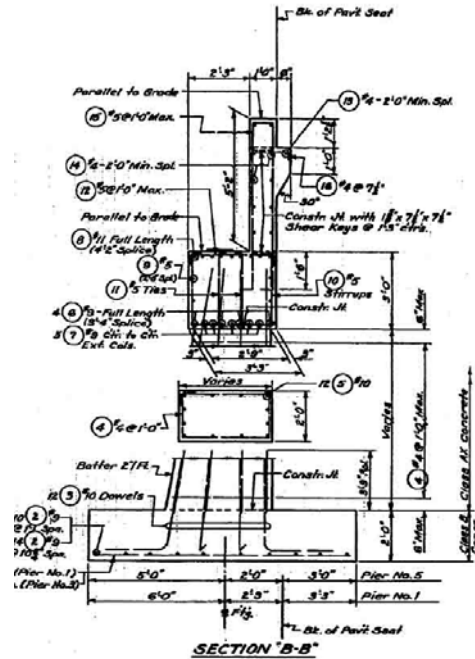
Bridge 512/19 Abutment Cross-section
